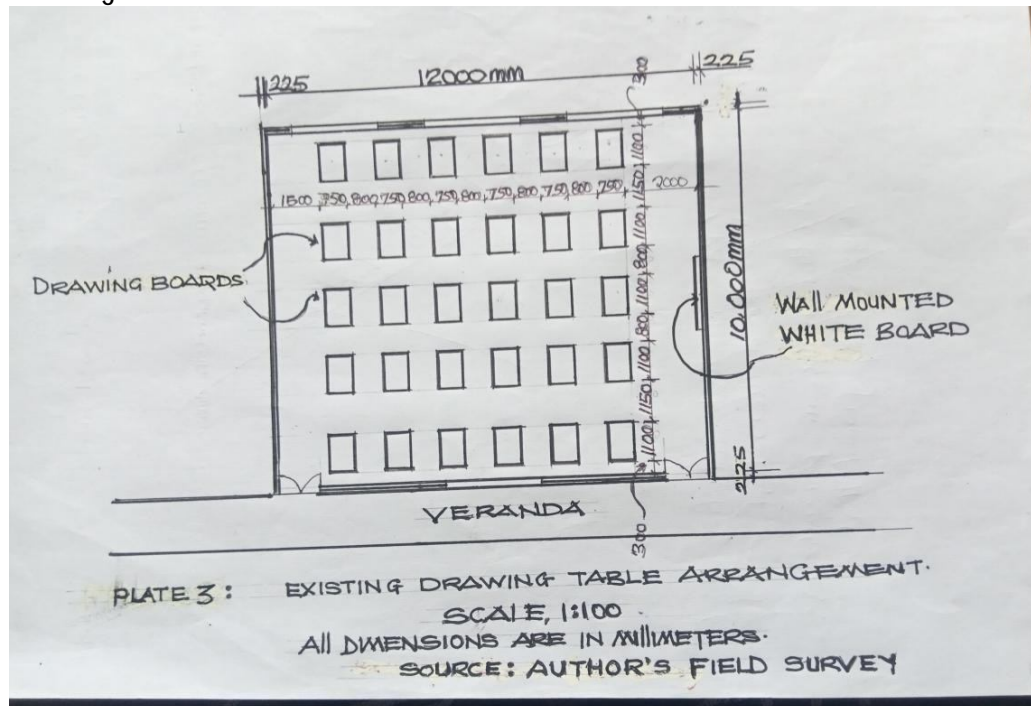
Existing drawing table arrangement in a drawing studio in the department. Notice the varied space in between drawing tables, 800mm-1150mm sideways, and 800mm in the front and back of tables. Size of drawing boards is 1100mm X 750mm.
